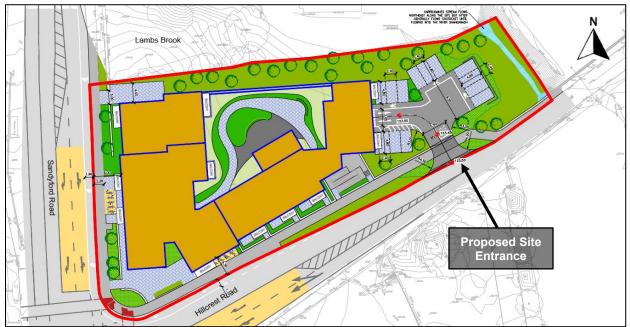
Site Plan (Cropped) (A refinement of this site layout may be circulated by the architect)
